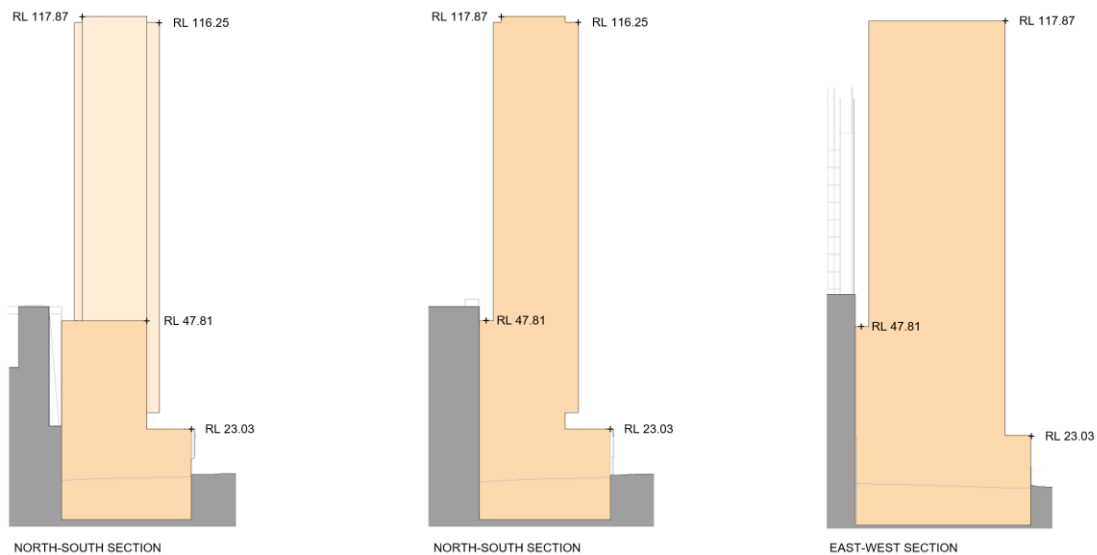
Section of proposed planning envelope (orange, right) and Capitol Terrace (grey, left)
